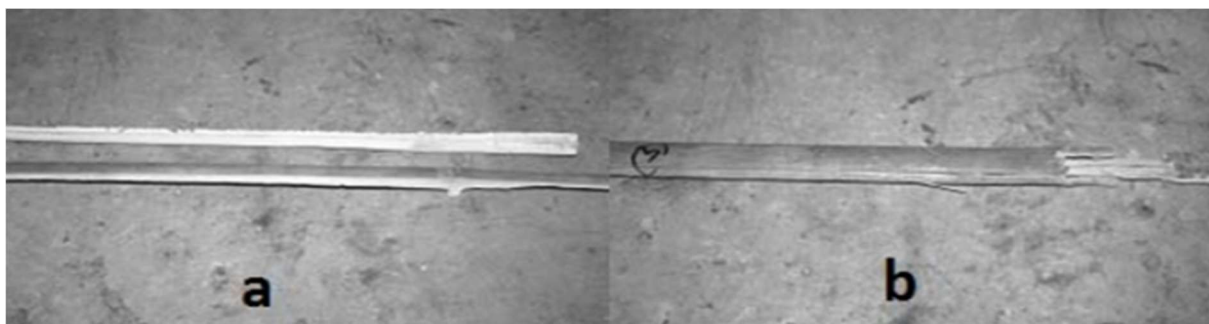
Banded column compression test (Kajjam et al., 2012)
